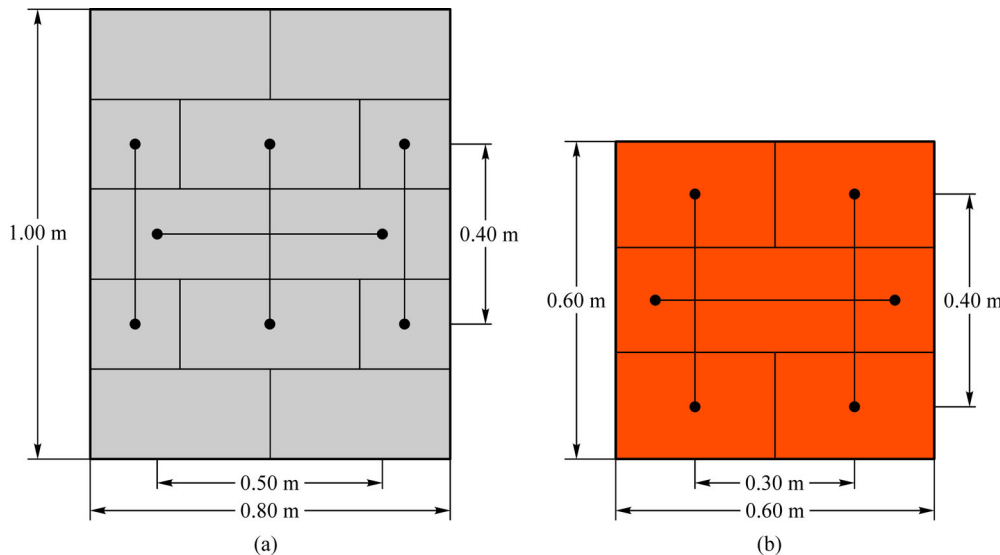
Compressive strength tests: specimens' geometric dimensions and instrumentation: (a) VHCB315; (b) HCHB specimens.
